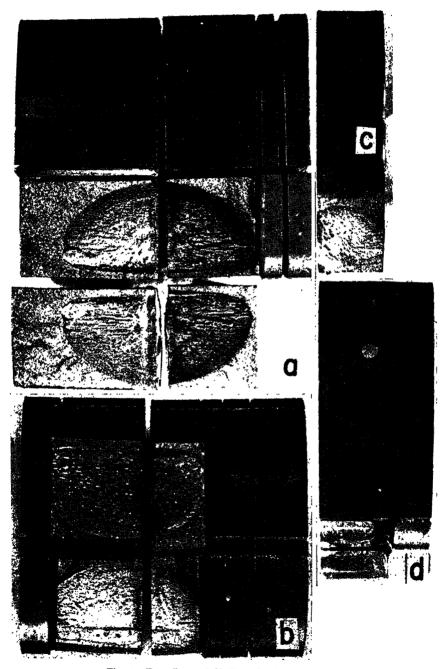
Four Internal Shelling Cracks in Rail 602.
